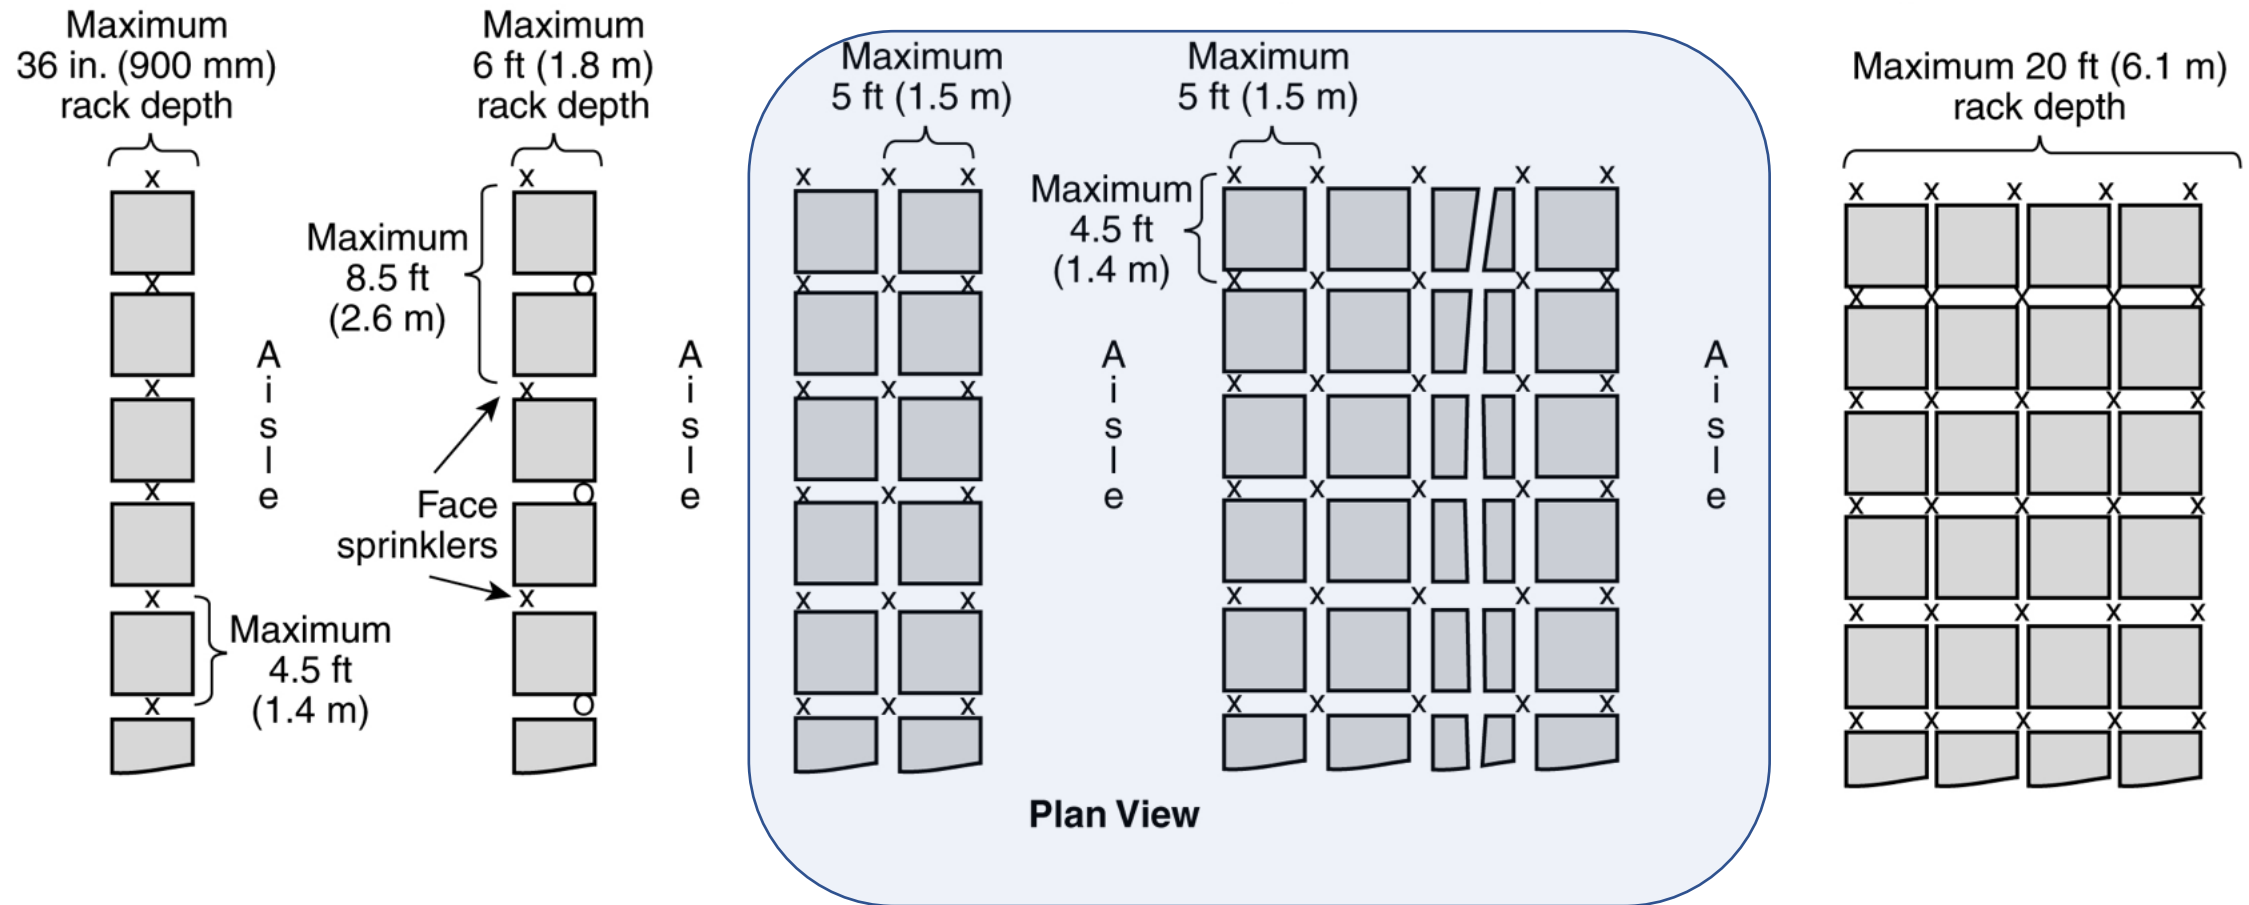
(f) Plan View of In-Rack Sprinkler Arrangement for Open Multiple-Row Racks.
